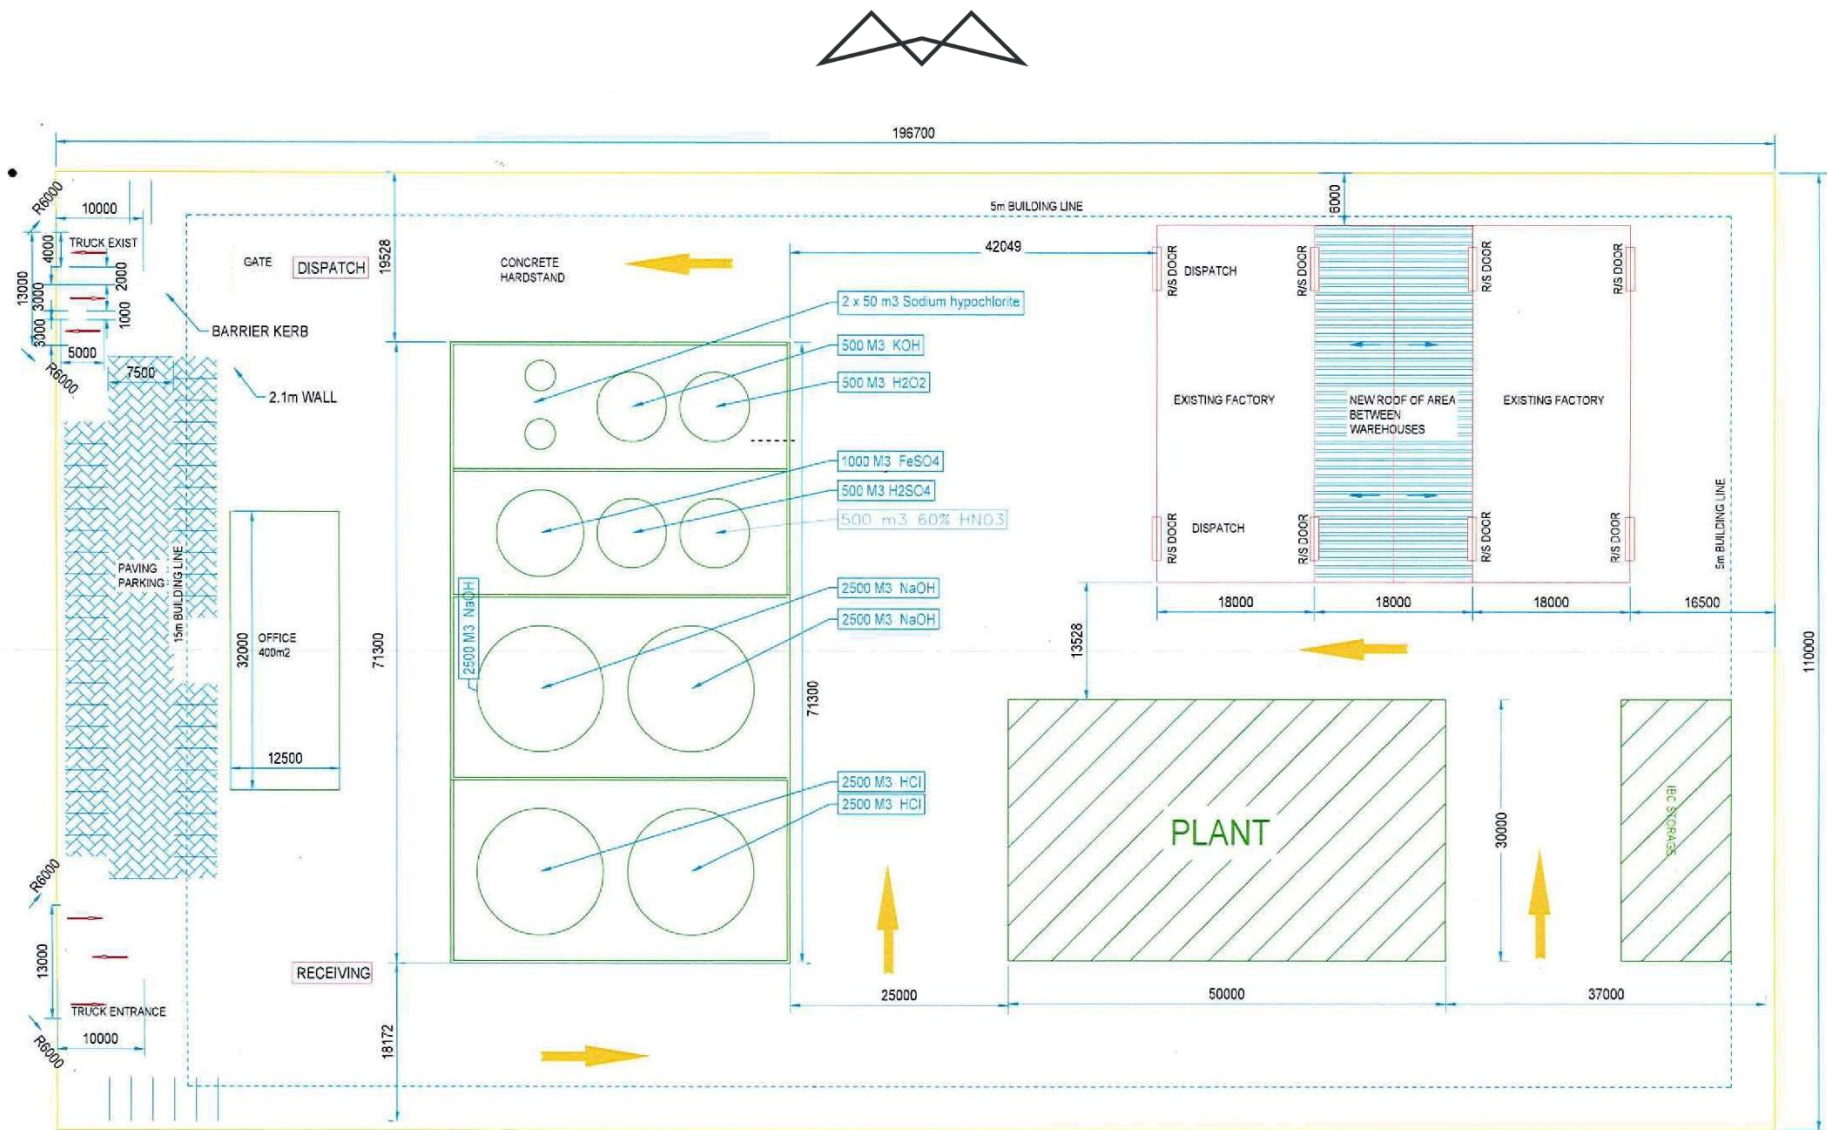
Proposed site layout of the NuVest Chemical Plant.
